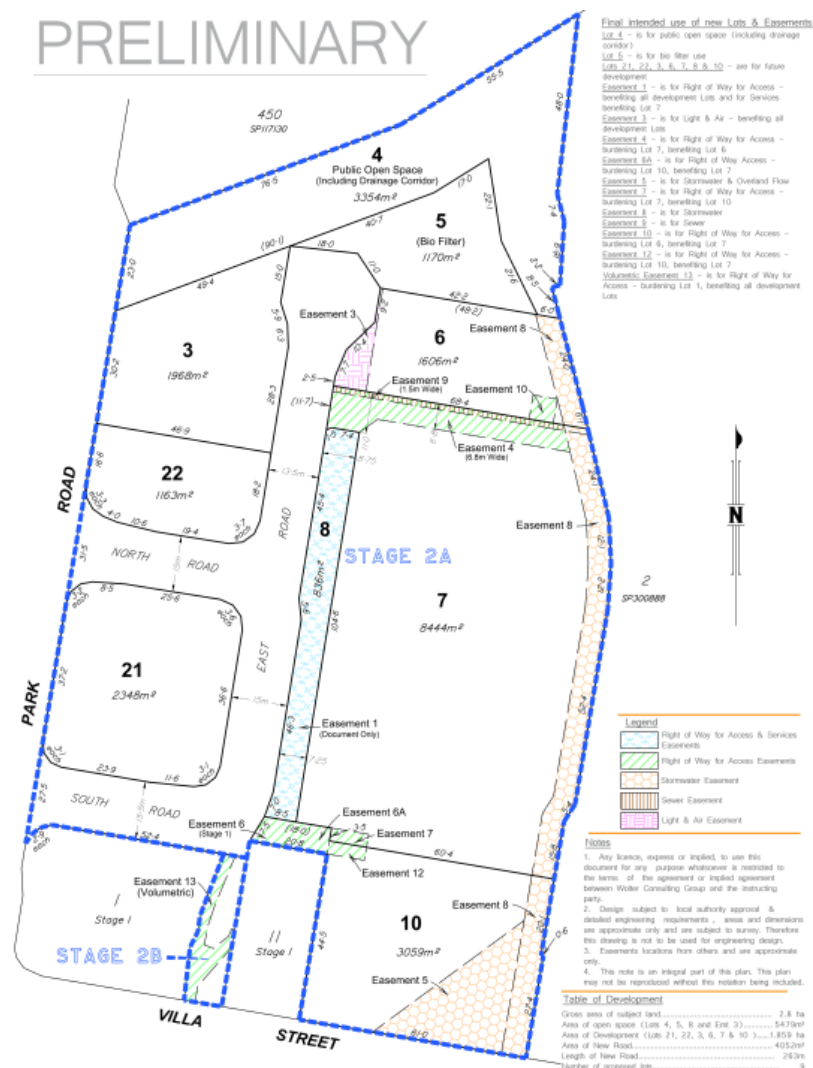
PROPOSED DEVELOPMENT LAYOUT PLAN (SOURCE: WOLTER CONSULTING GROUP, 2022)
